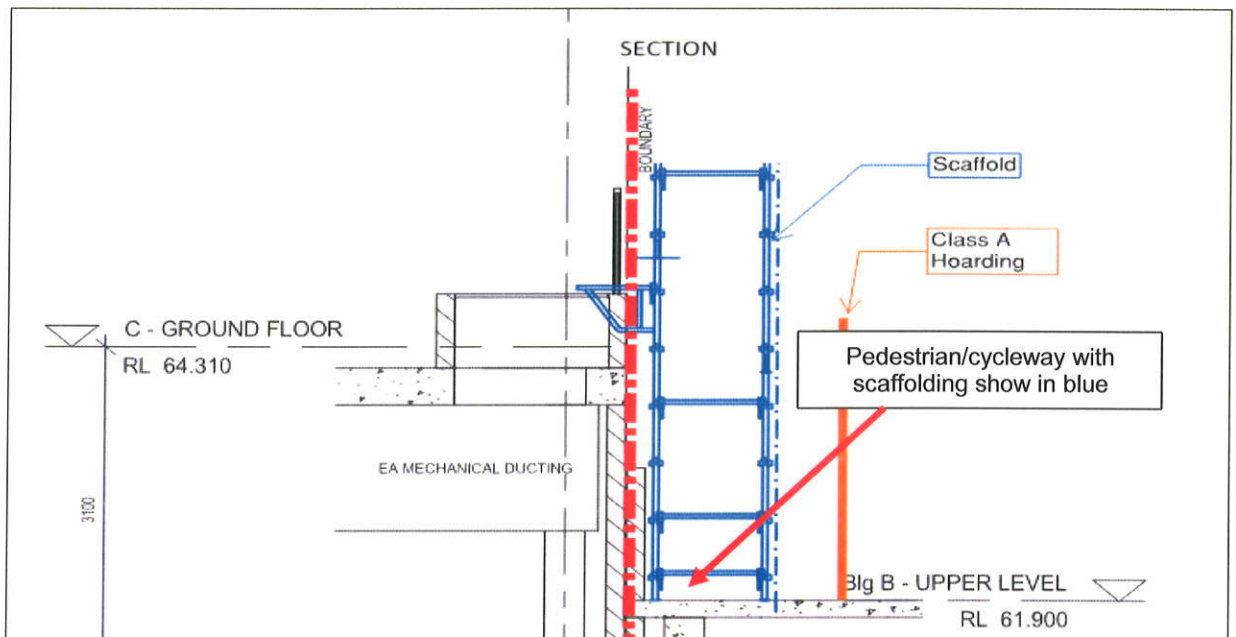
Section showing location of pedestrian/cycleway and scaffolding required to construct building C
